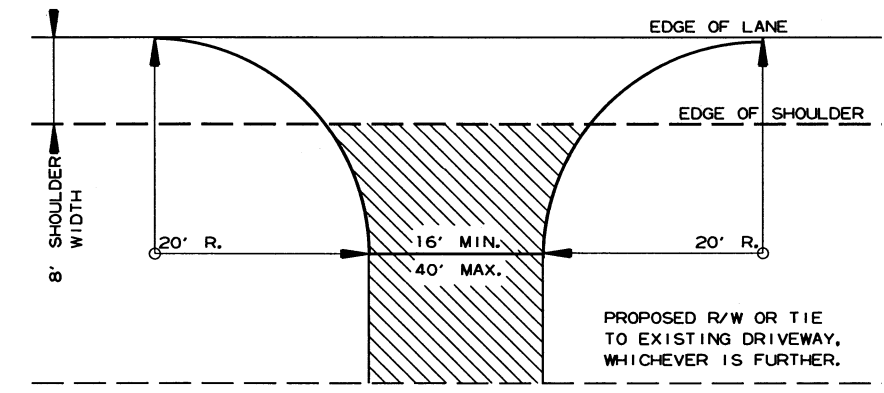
DETAIL FOR COUNTY ROAD TURNOUTS OPEN SHOULDER SECTION
